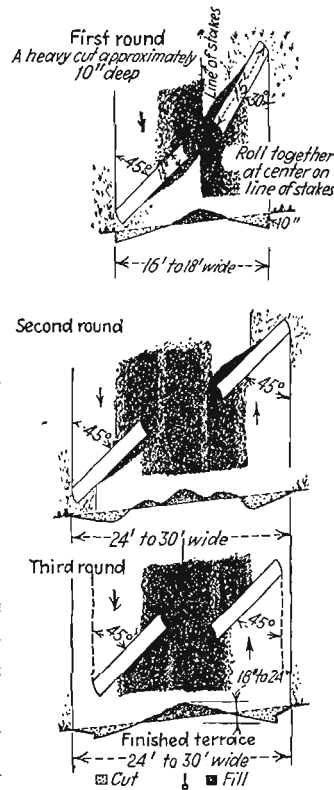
Showing angle of blade and cut for the first three rounds in constructing terrace with a road machine.
